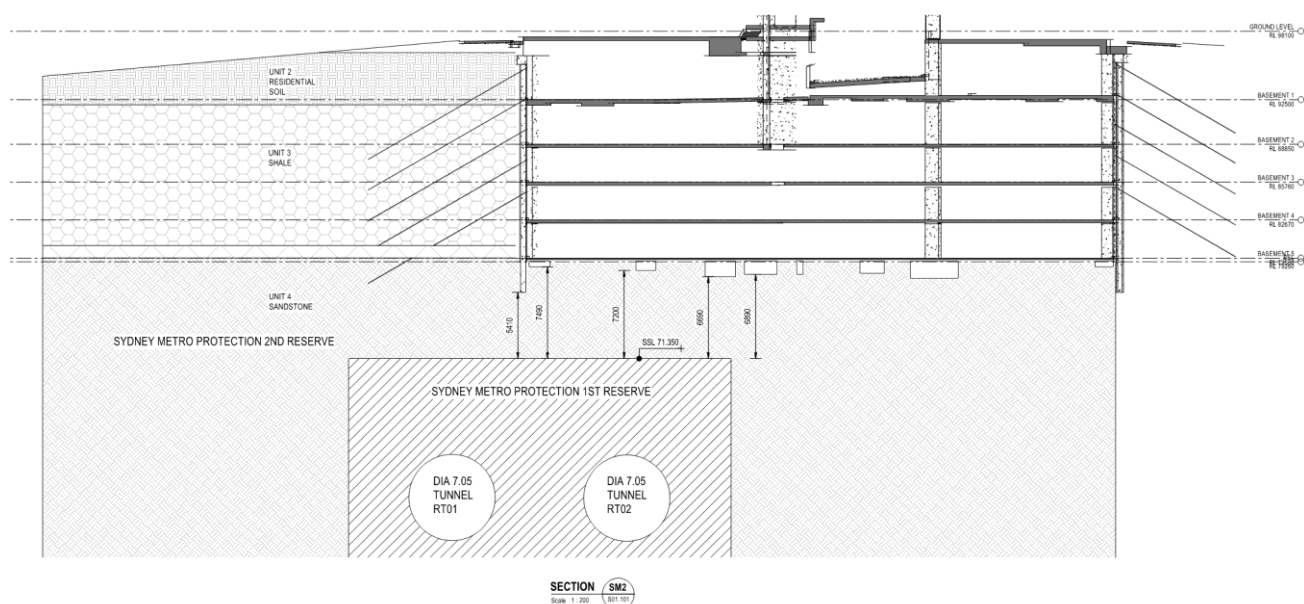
Extract from structural plan S01.102 showing Metro tunnels beneath the site
